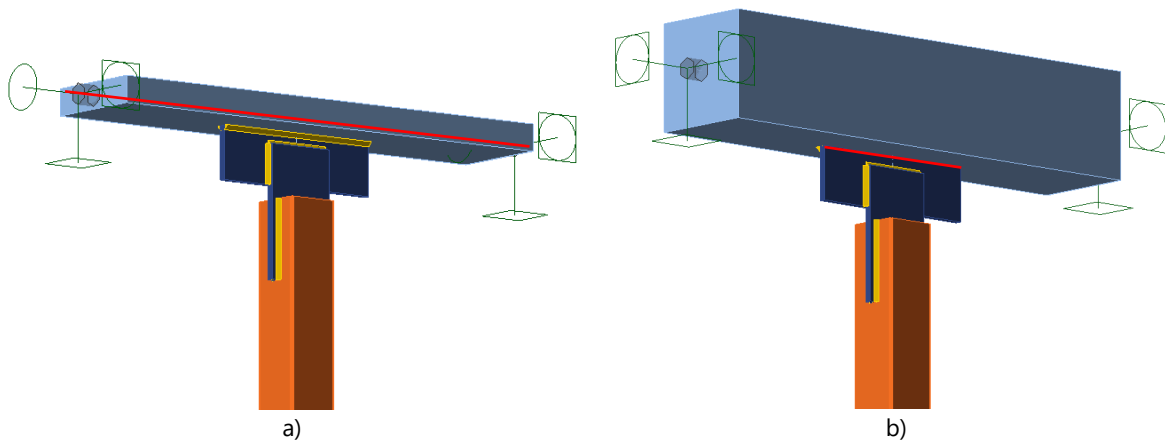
Locations of the hinges (in red): a) standard hinge above the plate; b) hinge modelled as a weld
